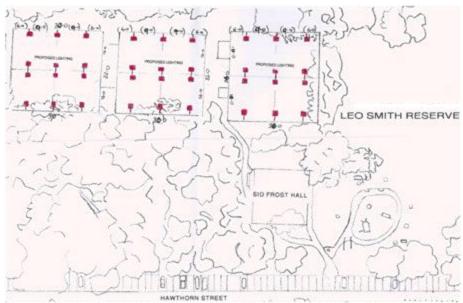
Extract of applicant's site plan depicting the positioning of the thirty-six (36) x 8m high light poles proposed. Each of the six (6) tennis courts is to contain six (6) light proles. Source: Applicant's submitted site plan
